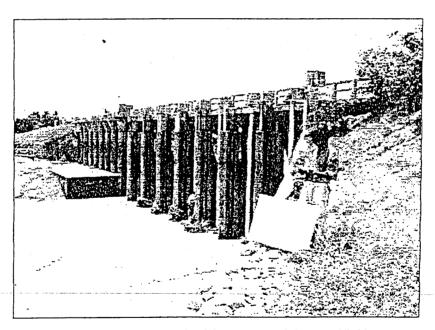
Slakou Regulator is a joint structure of NR3 Road Bridge
